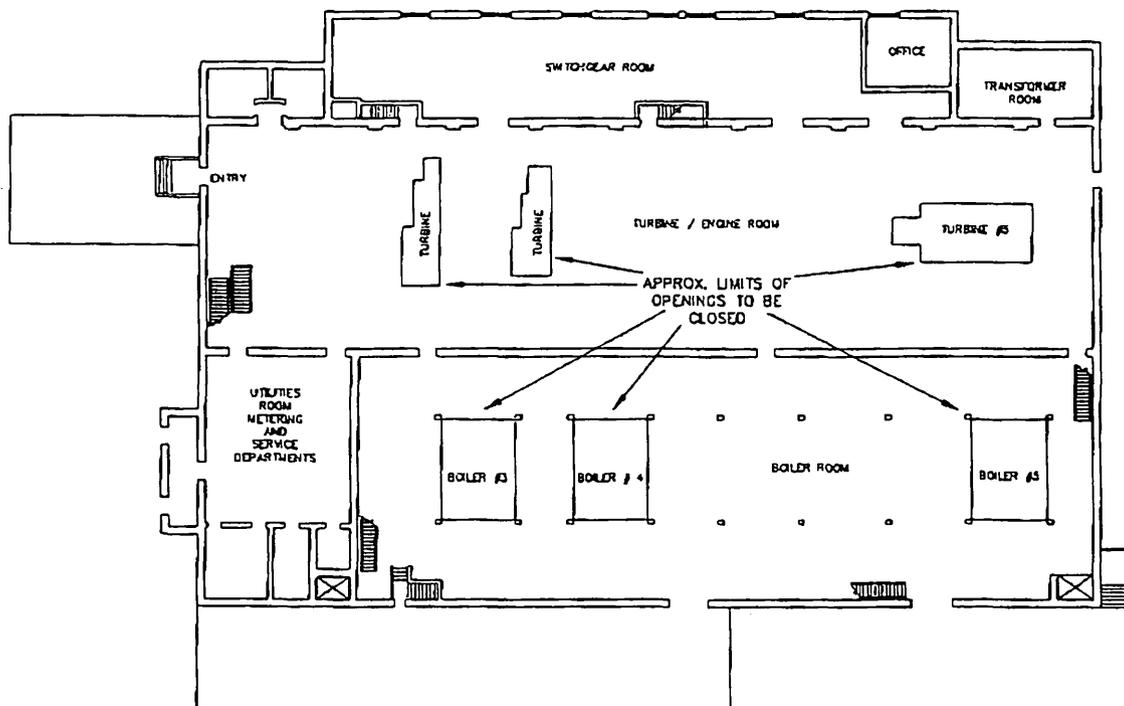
First floor plan, Fremont Municipal Power Plant and Pumping Station.
